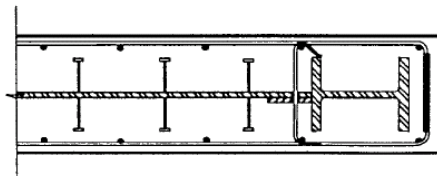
Concrete stiffened steel shear wall with composite (encased) boundary member.
